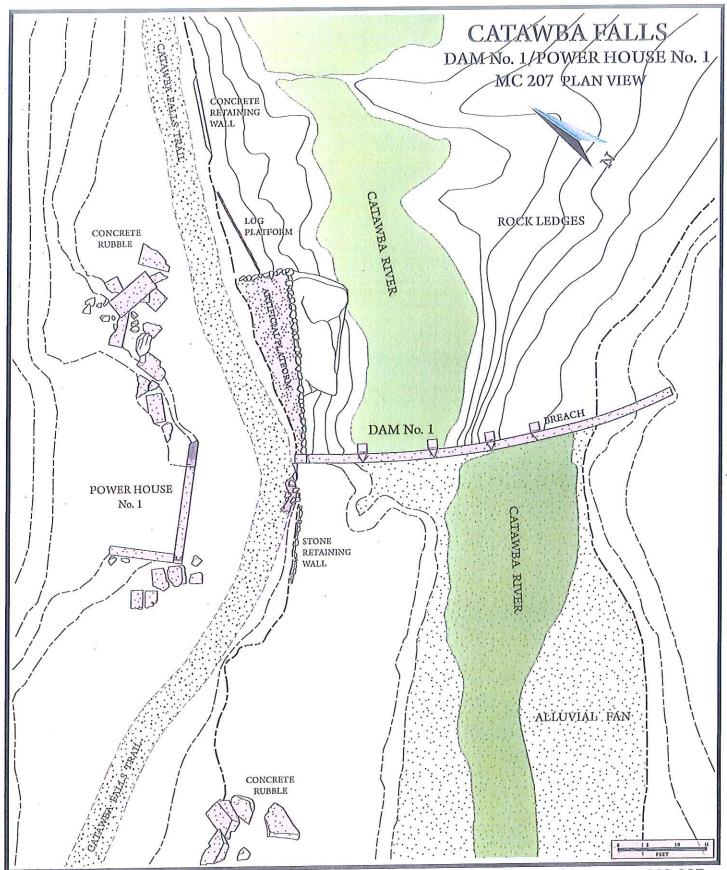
Plan view drawing of Dam No. 1, Power House No. 1, and associated features at MC 207.
